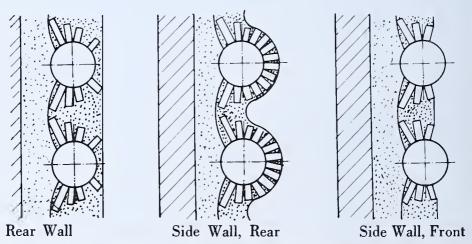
Furnace-Wall Cross Sections Showing Chrome Ore Insulation
